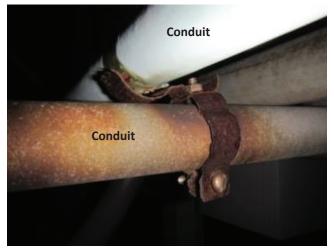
Heavily corroded and broken conduit straps
